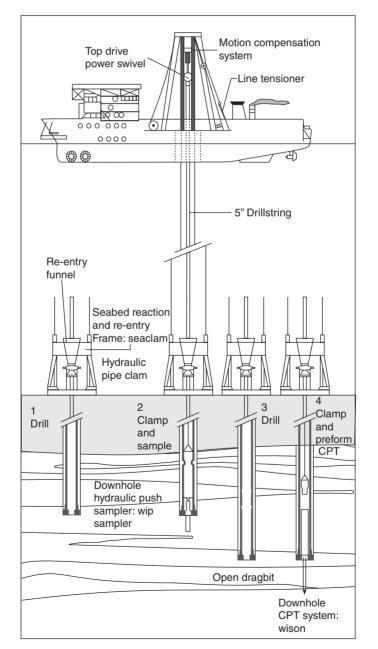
Drilling, sampling, and in situ testing through the drill string. (Courtesy of the ISSMGE Technical Committee on Offshore Geotechnics.)
